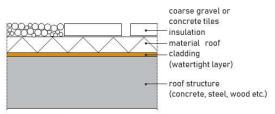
Inverted roof. The insulation sheets (extruded polystyrene foam) are simply laid onto on the roof covering, and covered with coarse gravel or tiles to protect them from sunlight (ultraviolet) and to prevent them being blown off.
